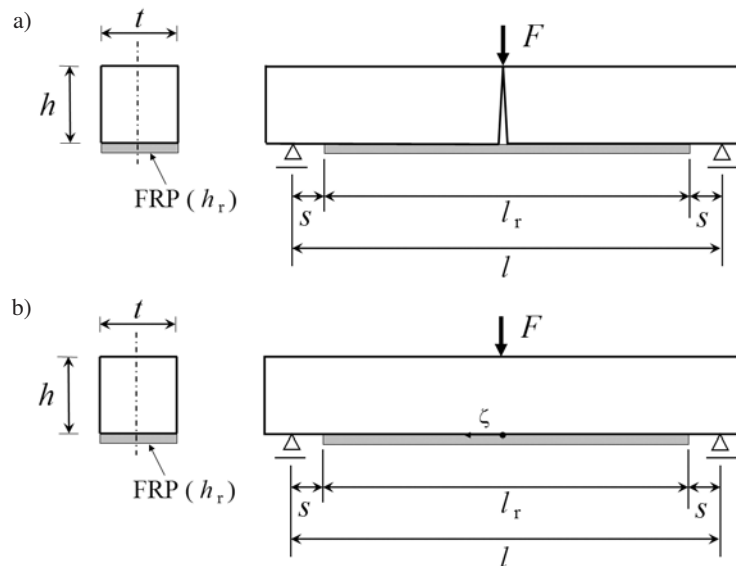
Scheme of the three-point bending test: notched beam or beam with a fully developed flexural crack (a); unnotched beam (b)
